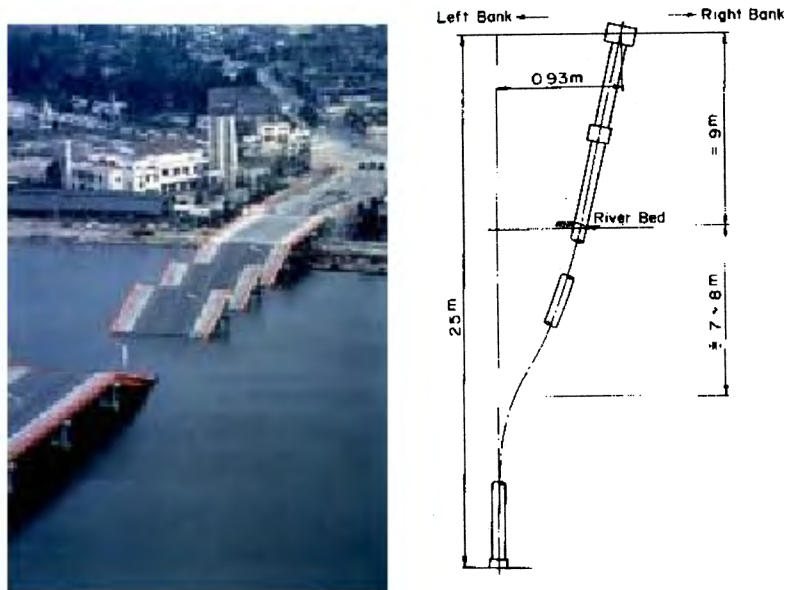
A view of the Showa Bridge failure during 1964 Niigata earthquake and the schematic section of pile extracted from the foundation.
